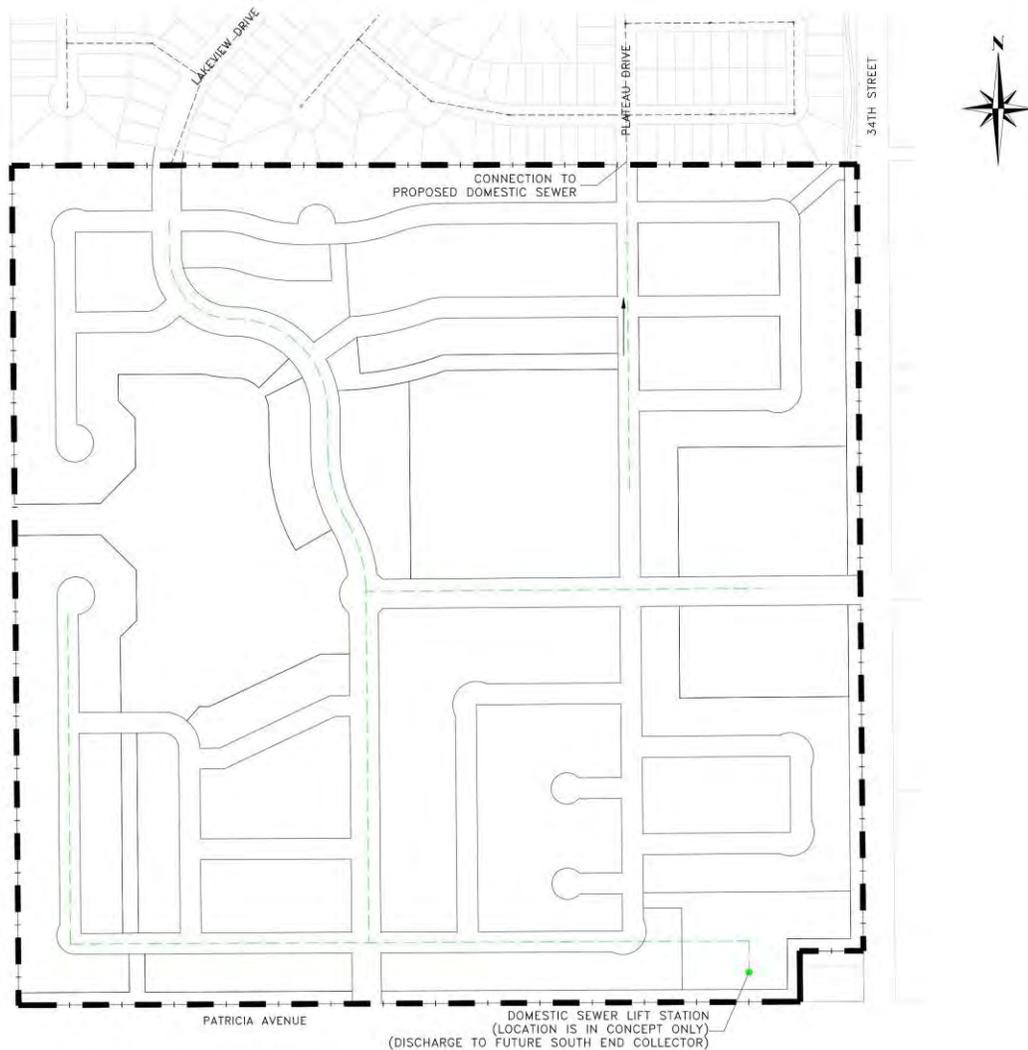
WASTEWATER COLLECTION SYSTEM LAYOUT
